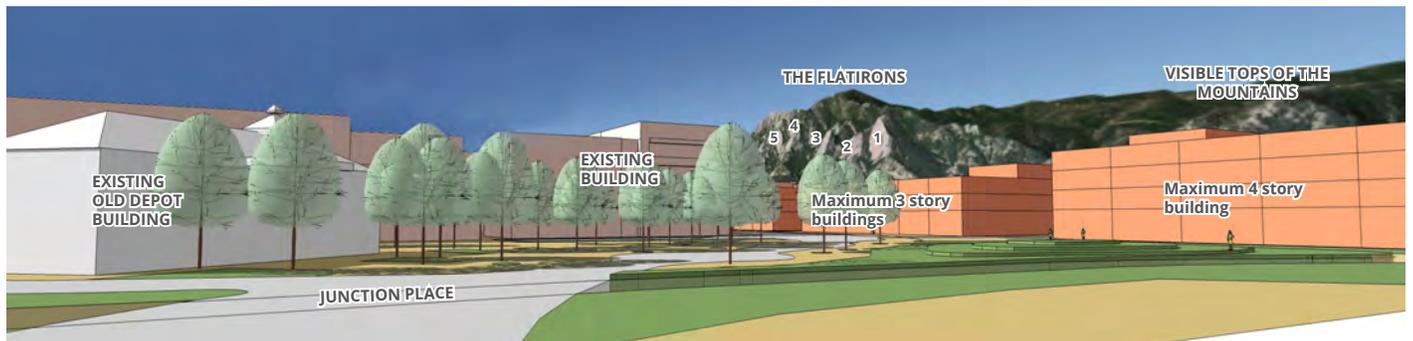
(4). Example Documentation of Preserved Views from Junction Place Bridge
